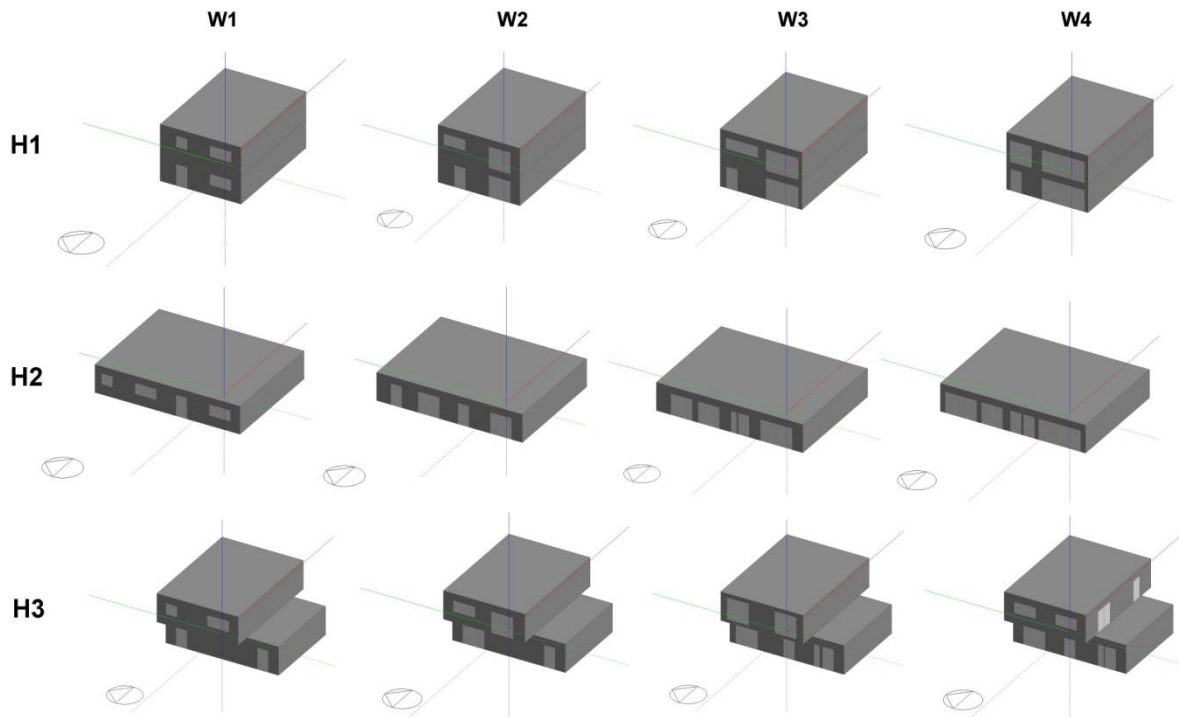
Axonometric models of the building design alternatives: house building shapes and window sizing
